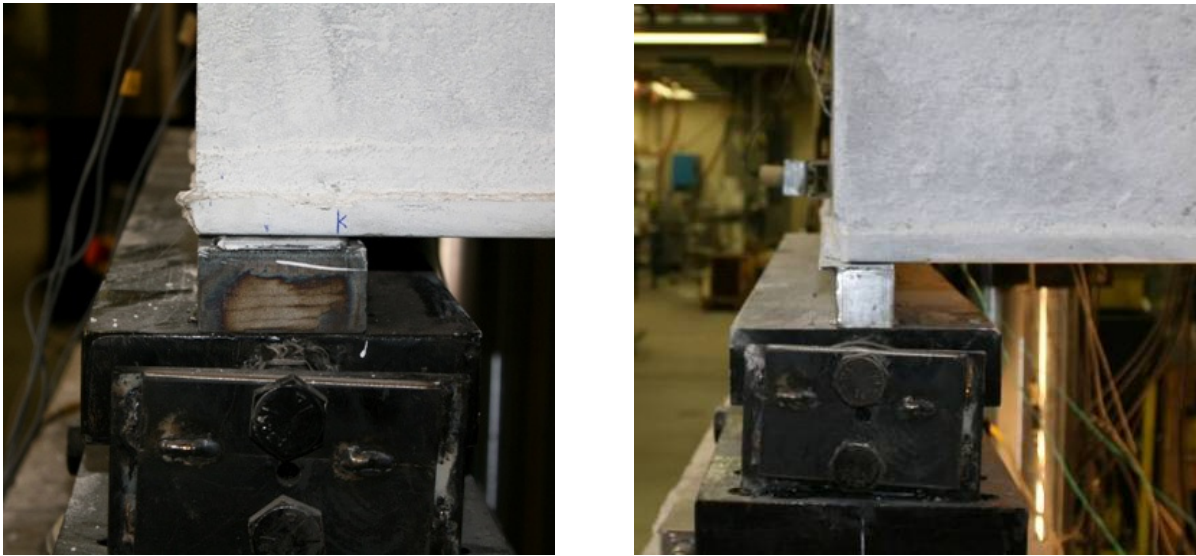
Tested End of Slab with 63 and 38 mm Bearing
